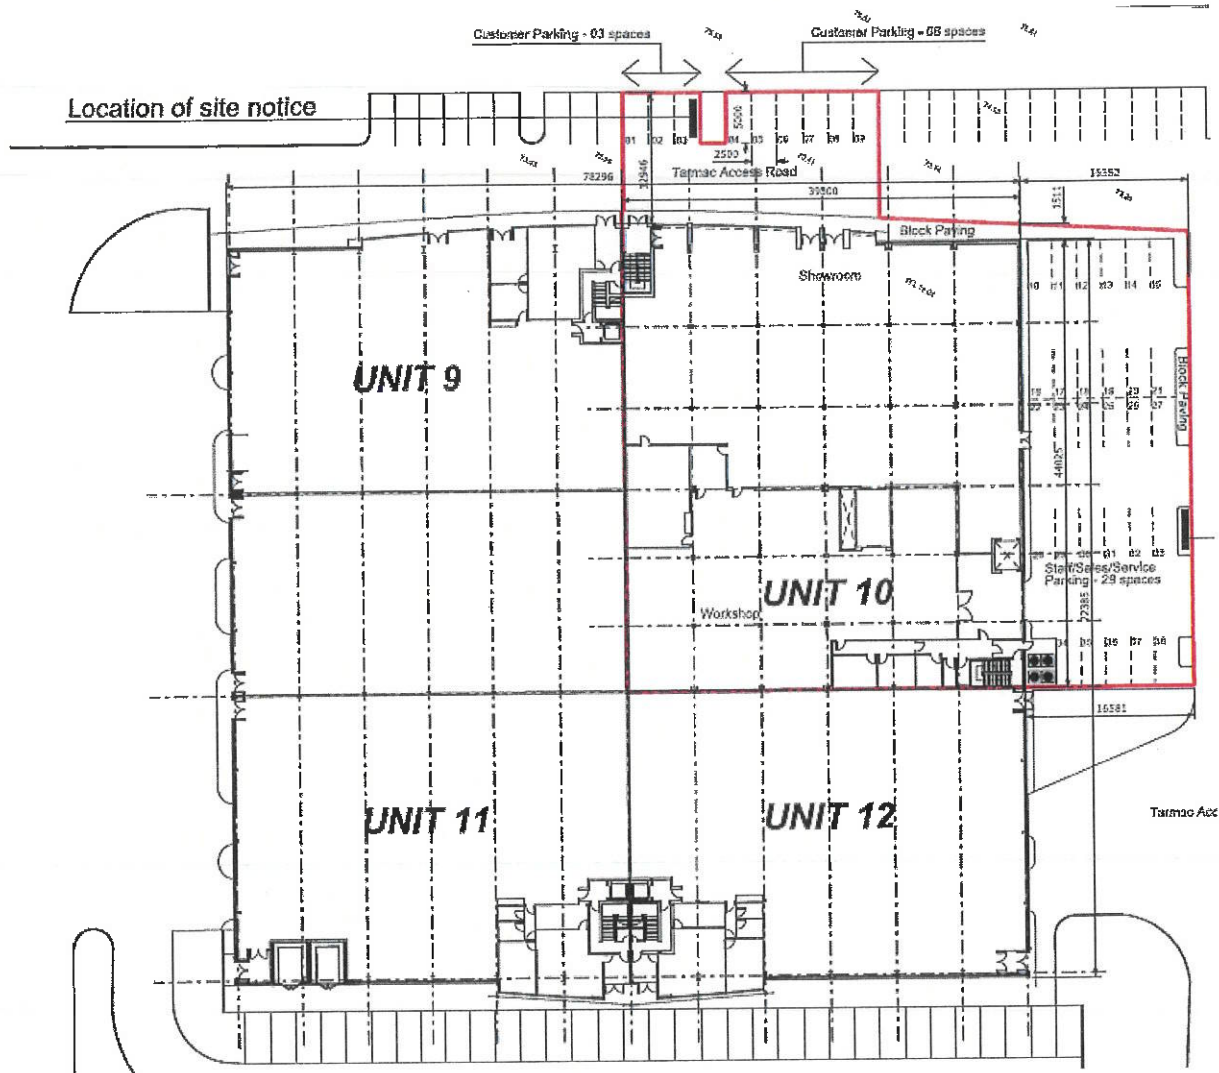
Existing site layout plan submitted under Reg. Ref. FW18A/0015
